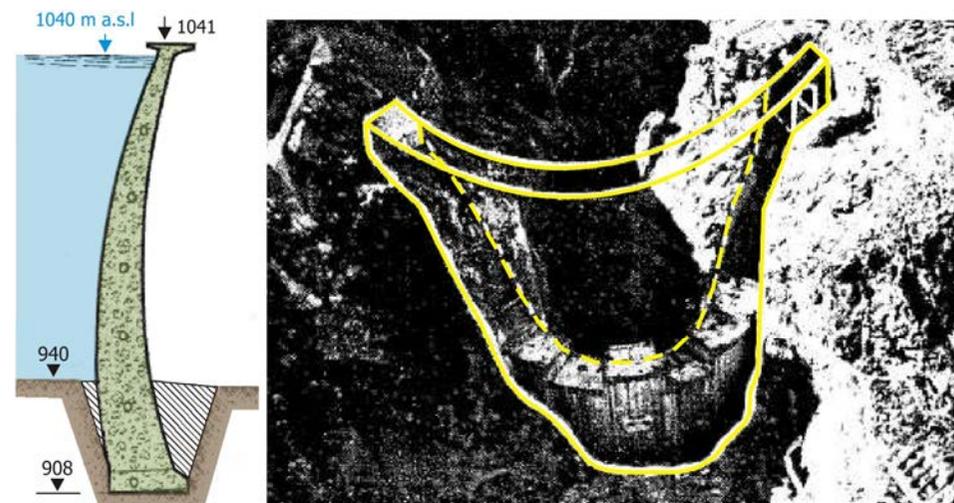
Cross section showing the central profile and foundation of the Quentar concrete arch dam with a view of the dam under construction showing the outline of the completed dam projected in yellow colour (adapted from "Inventario de Presas Españolas" ICOLD, 1973)
